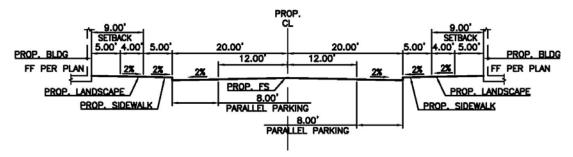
Typical Private Road Section with Parking on Both Sides Section F
